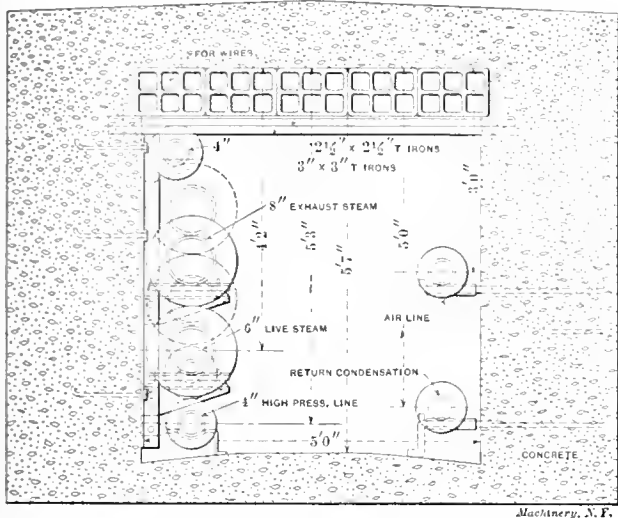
Cross-section of Tunnel used for Pipes and Electric Conductors only.
